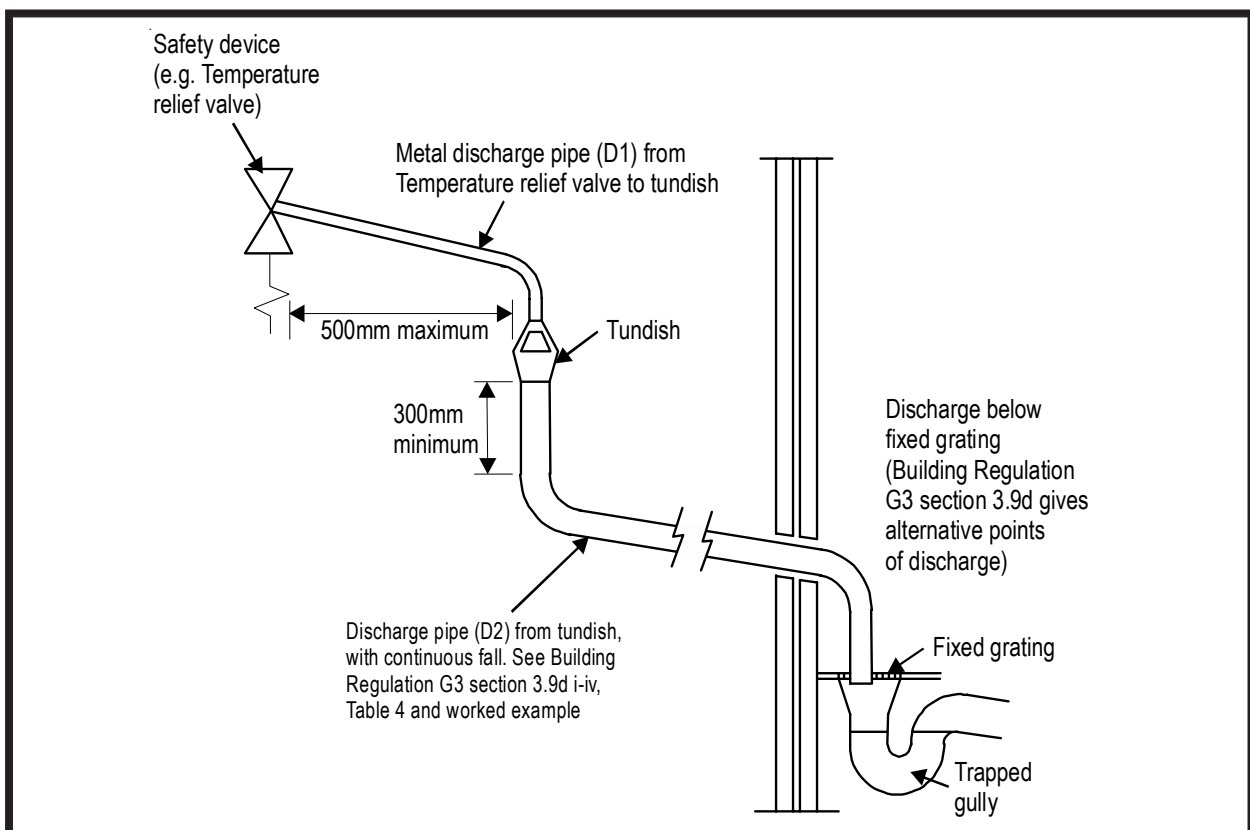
Typical discharge pipe arrangement (extract from Building Regulation G3 Guidance section 3.9)
